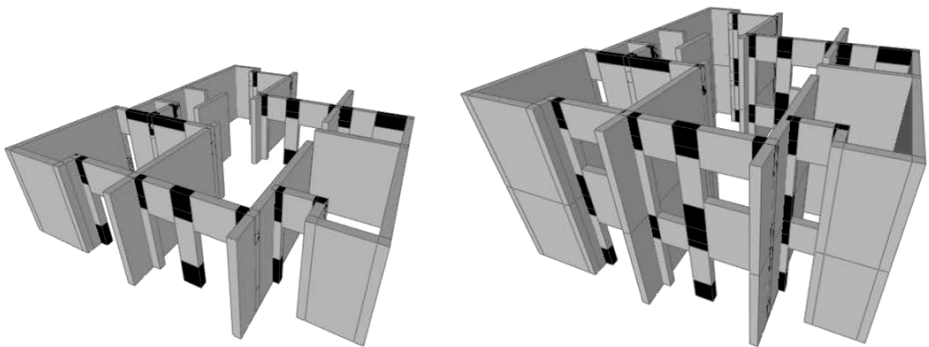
Extruded views of the frame models for one- and two-story masonry buildings.
